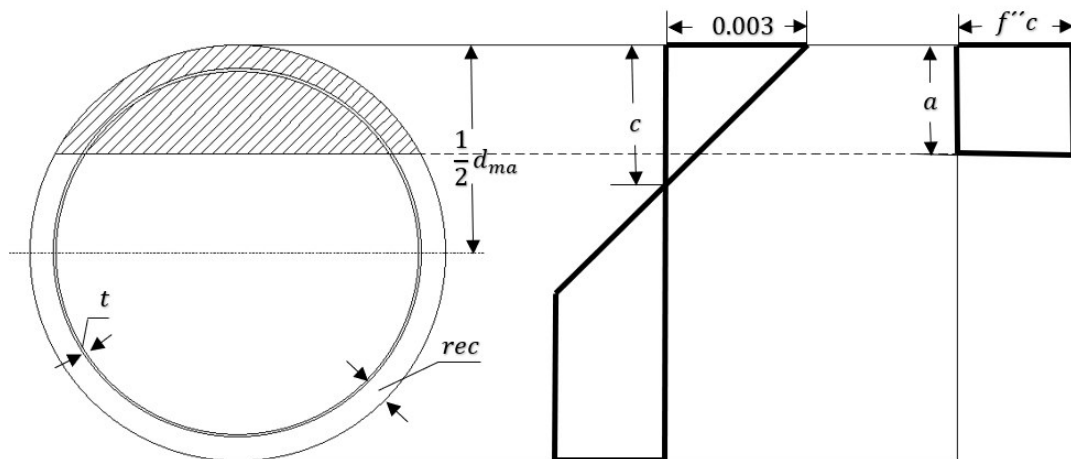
Strain distribution diagram for the concrete element cross section. *Own made drawing.
